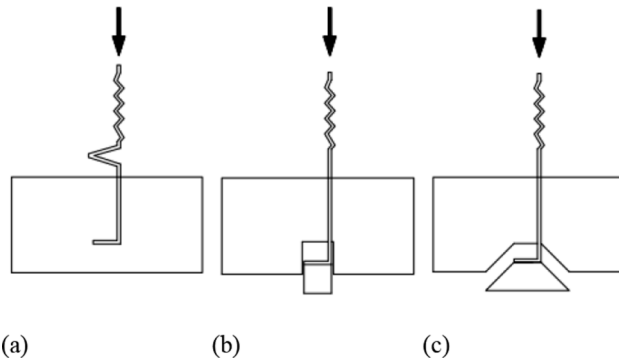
Failure modes in Compression: Buckling failure(a), Piercing failure (b), Punching failure (c).
